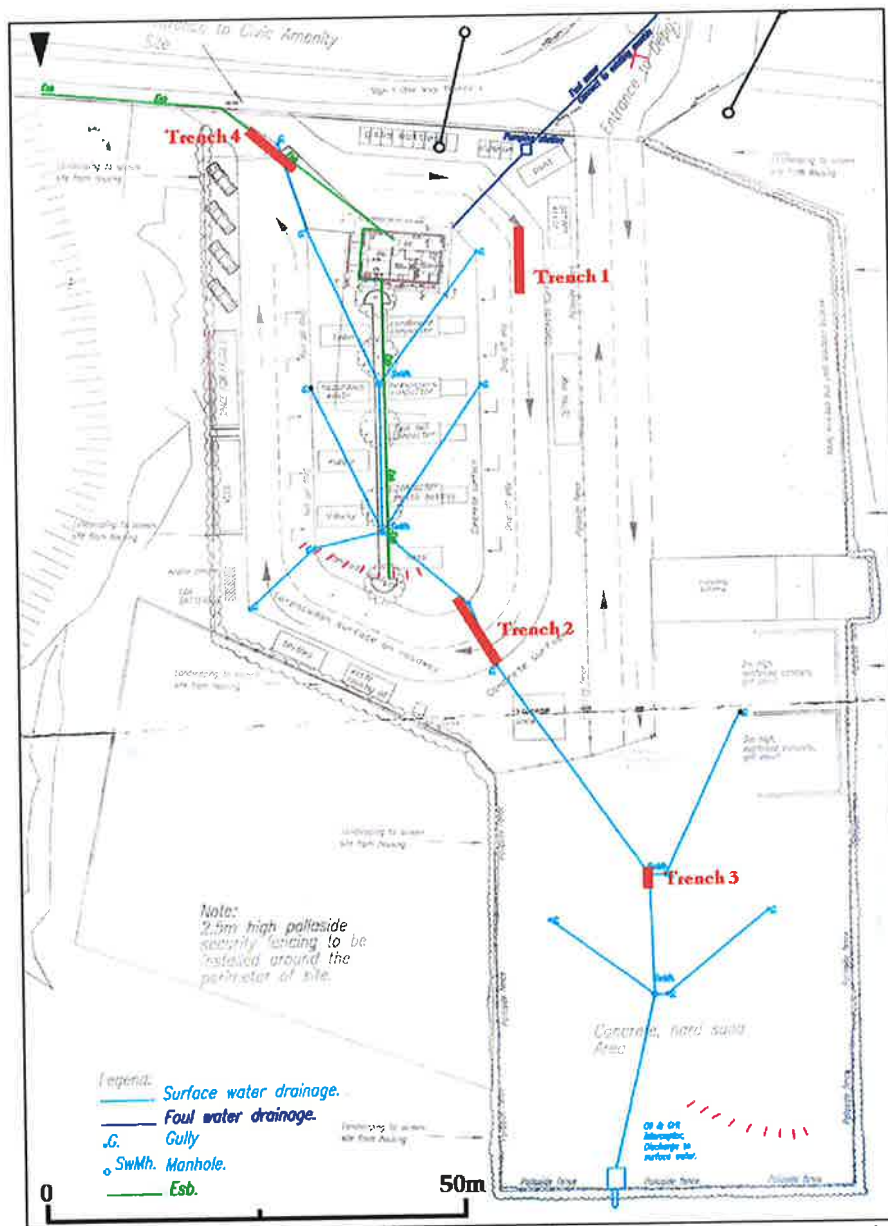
Layout of trenches on site in red (for indication only, trenches not to scale, north to bottom)
